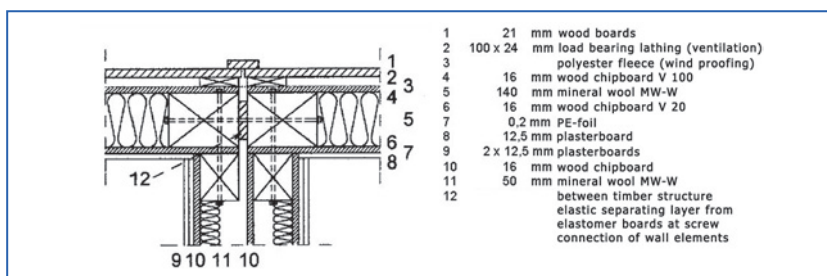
Connection between outer wall and wall separating flats (horizontal section).
